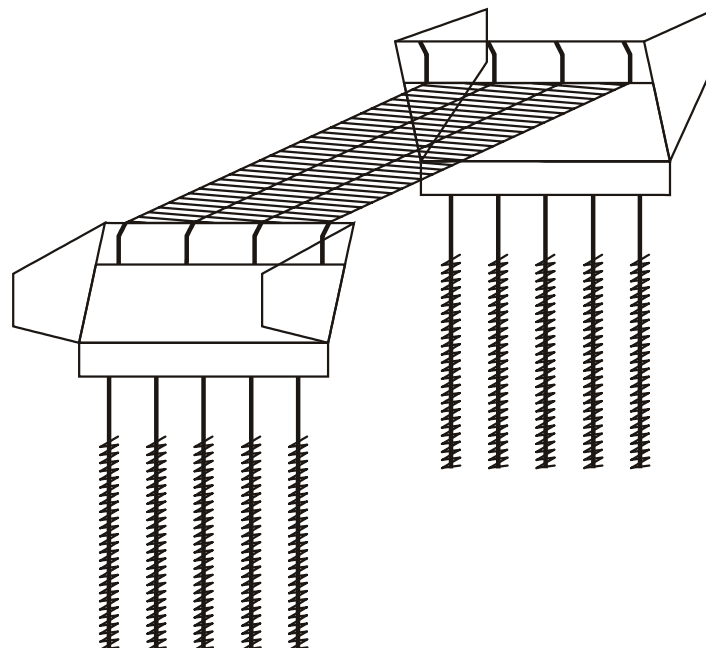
3D view on a typical frame system with gird modelised superstructure, FE abutments and embedded pile elements
